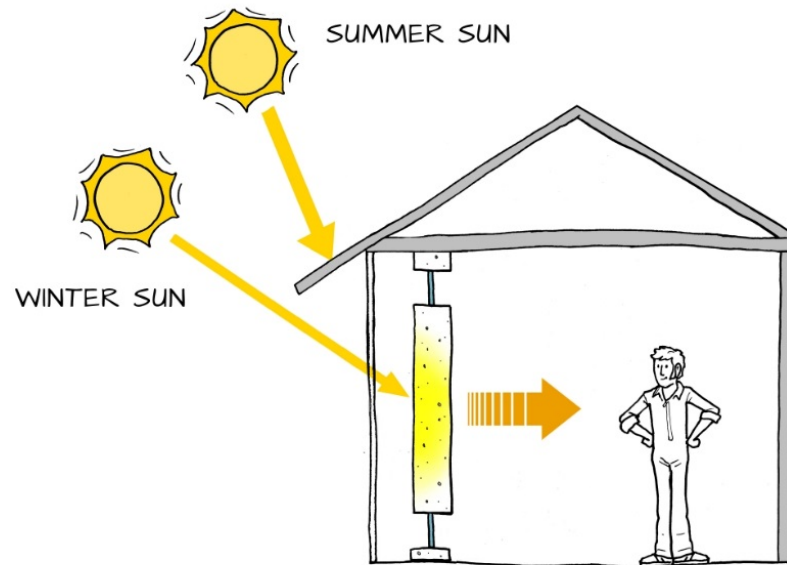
Scheme of a Trombe Wall with overhang. [41]
